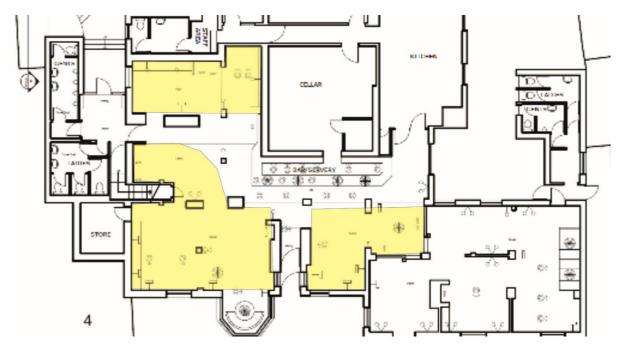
Site Plan and ground floor areas to be monitored in yellow
